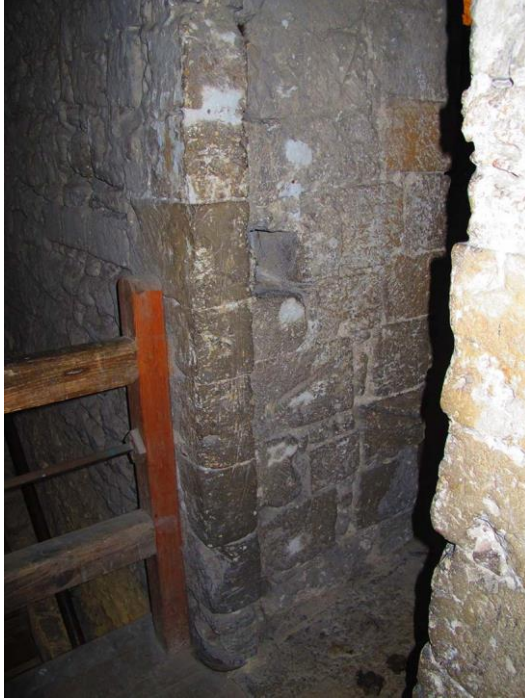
Portchester Castle, Hampshire: close up, door in the interior spine wall, second floor of the keep. The door jamb implies access from the north room to the south room. Photo by the author.
